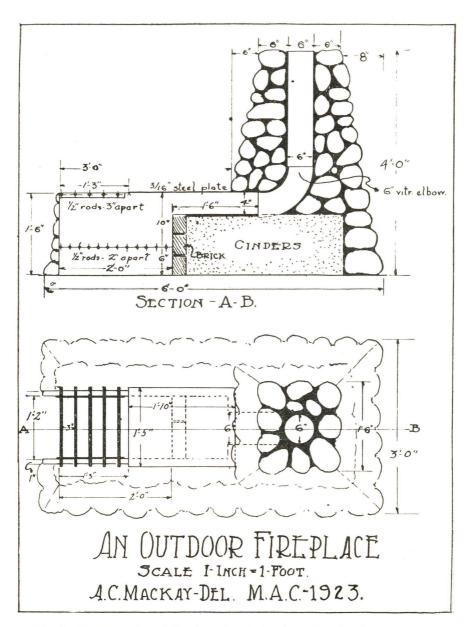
Working plan of fireplace for picnic grounds built of native stone.
